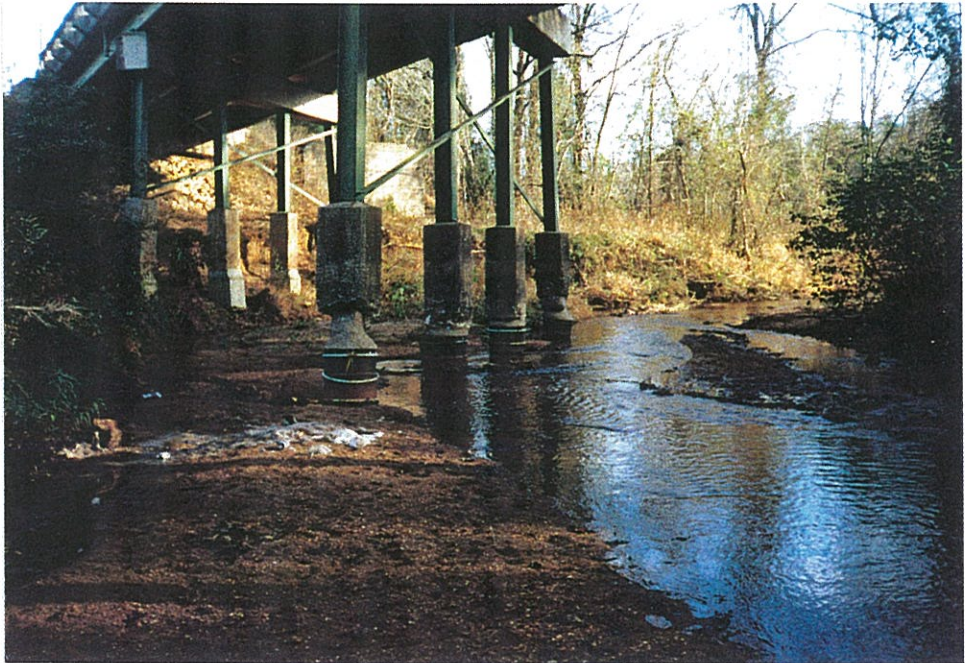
Downstream view (the piles at bent 3 are in the foreground).
